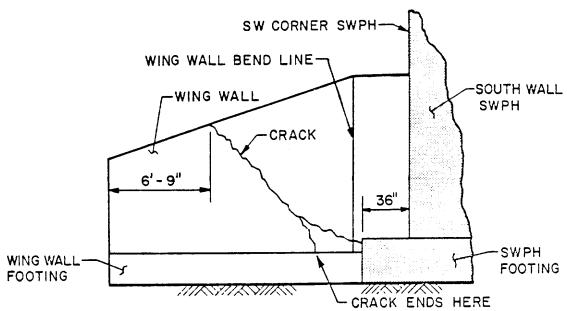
(SHEET 1 OF 3) WING WALLS: SERVICE WATER PUMP HOUSE
